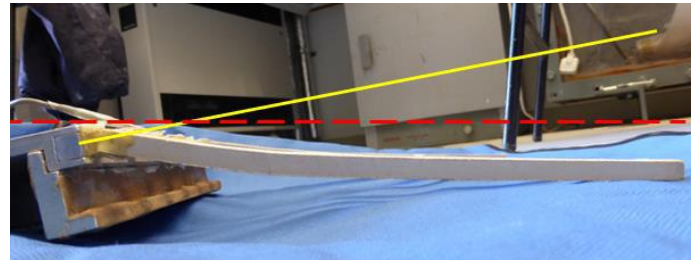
Abutment-piles assembly post-test, where piles’ significant bending is apparent. Piles original position referring to the abutment (continuous line) and assembly initial position (dashed line). Both the abutment and the piles rotated.
